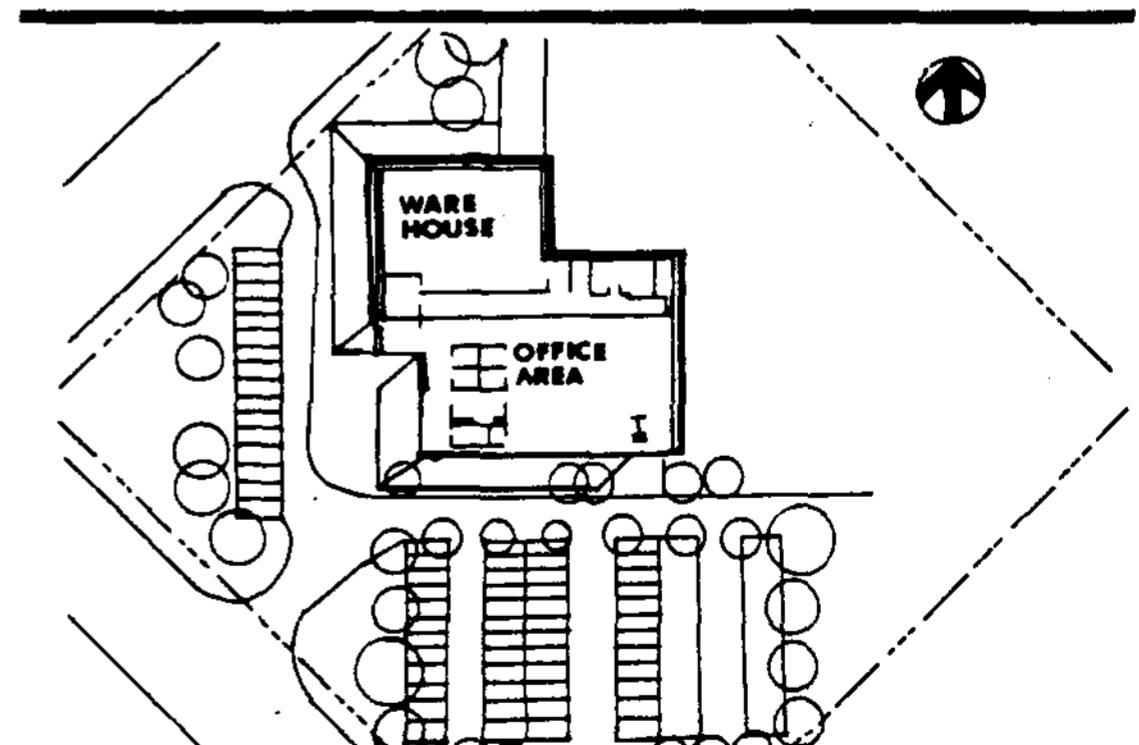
A site/floor plan of the Johnson Controls SLC branch office
